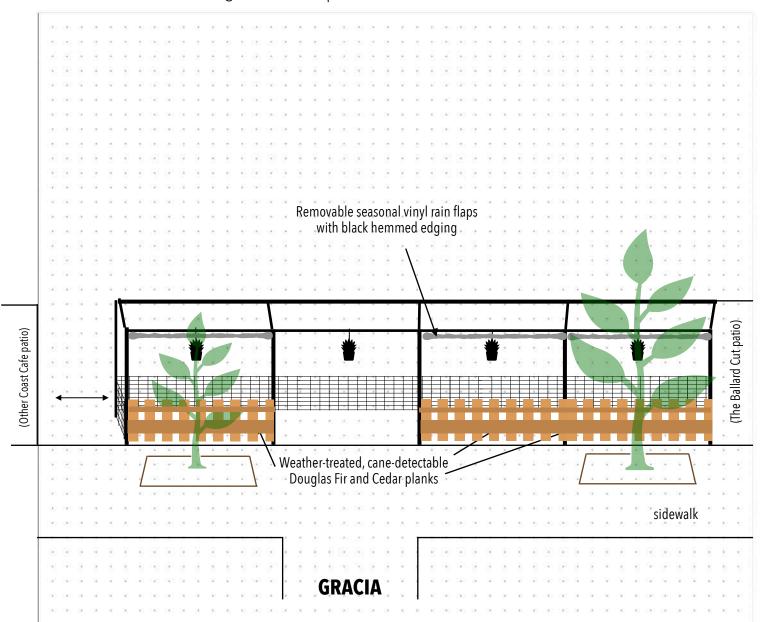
Patio shown from the north side. Note that every other wood plank will be removed and a toe rail will be added.
